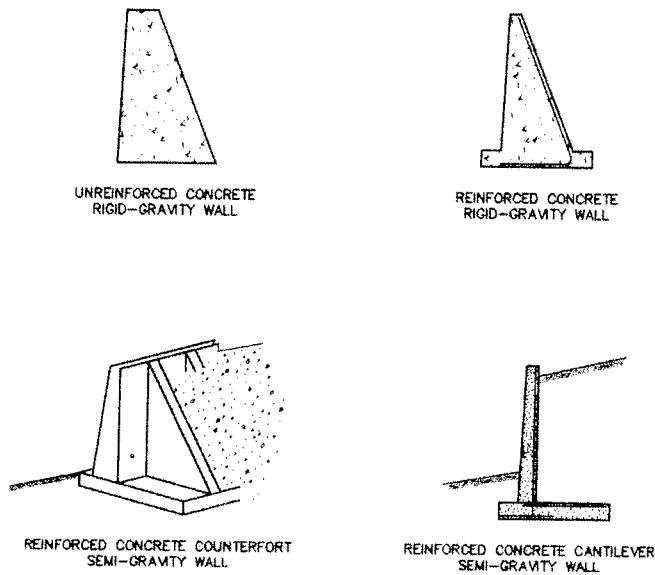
Typical Rigid Gravity and Semigravity Walls.
